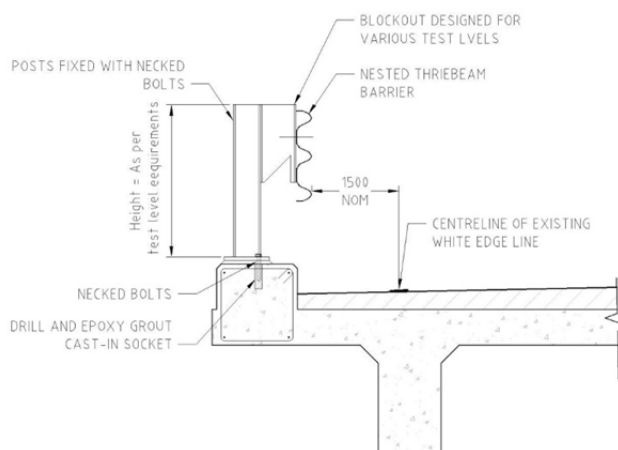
Typical Cross Section- Semi-rigid Barriers
